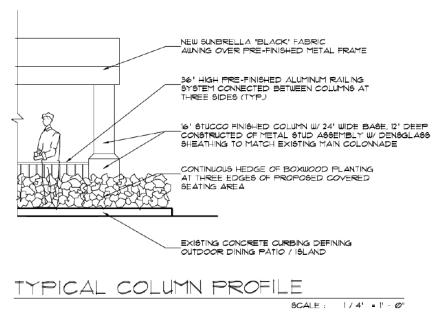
illustrates the typical column profile proposed in this request. As seen in Figure 2 & 3, it appears that there will be 4 columns that will have a stucco finish and the two center columns will retain their 3"  $\times$  3"  $\times$  14" tube column.
